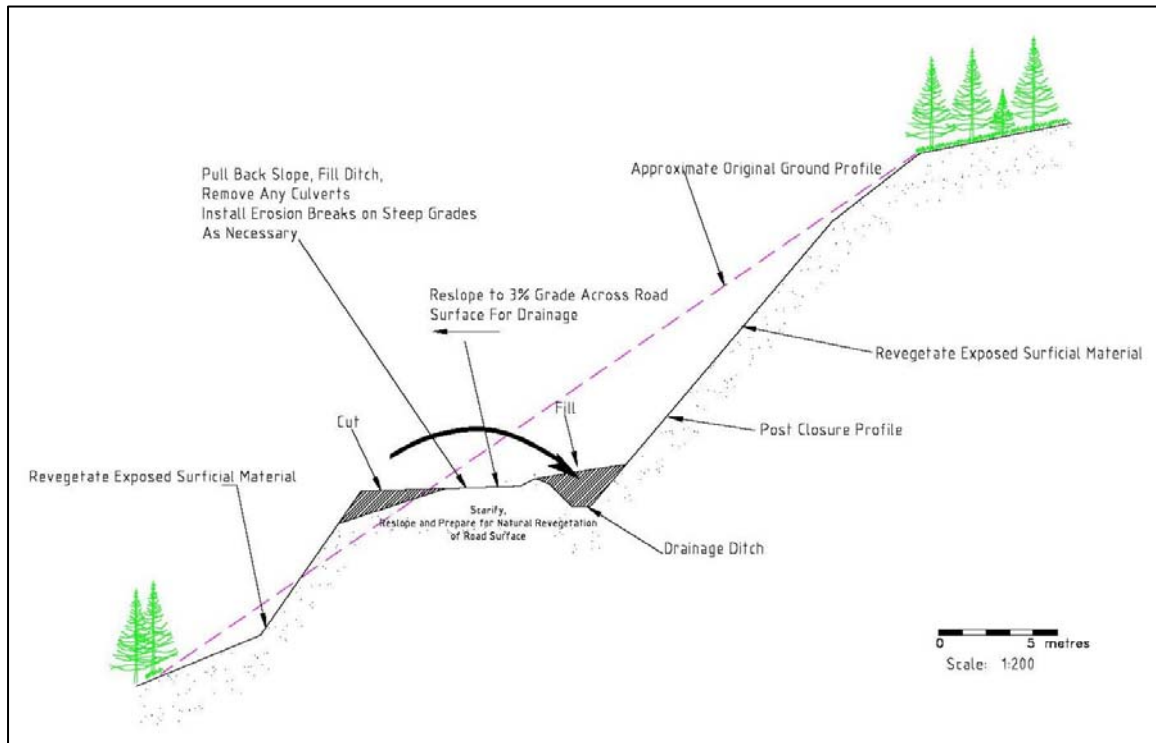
Haul Road and Site Road Typical Reclamation Cross-Section
